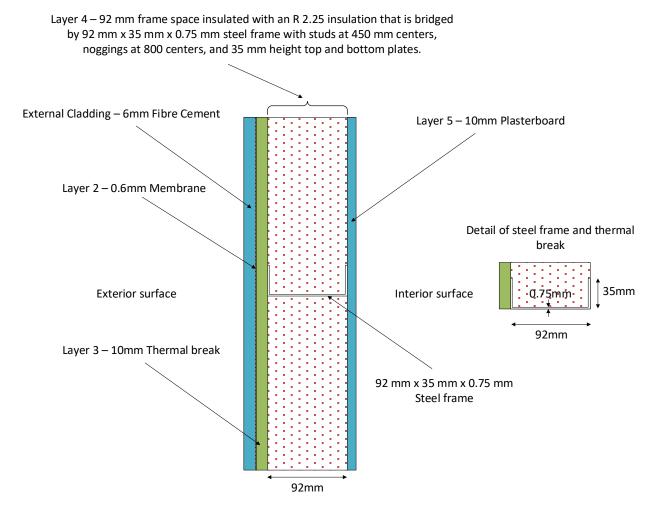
LWDF STEEL FRAME WALL BUILD UP
